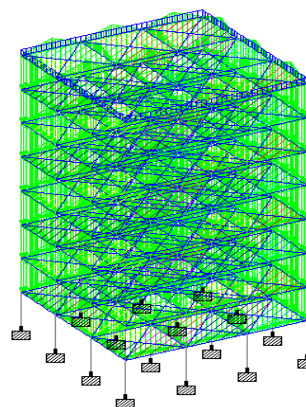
Assigning of Parapet Wall Load Load (3.84KN/m)
